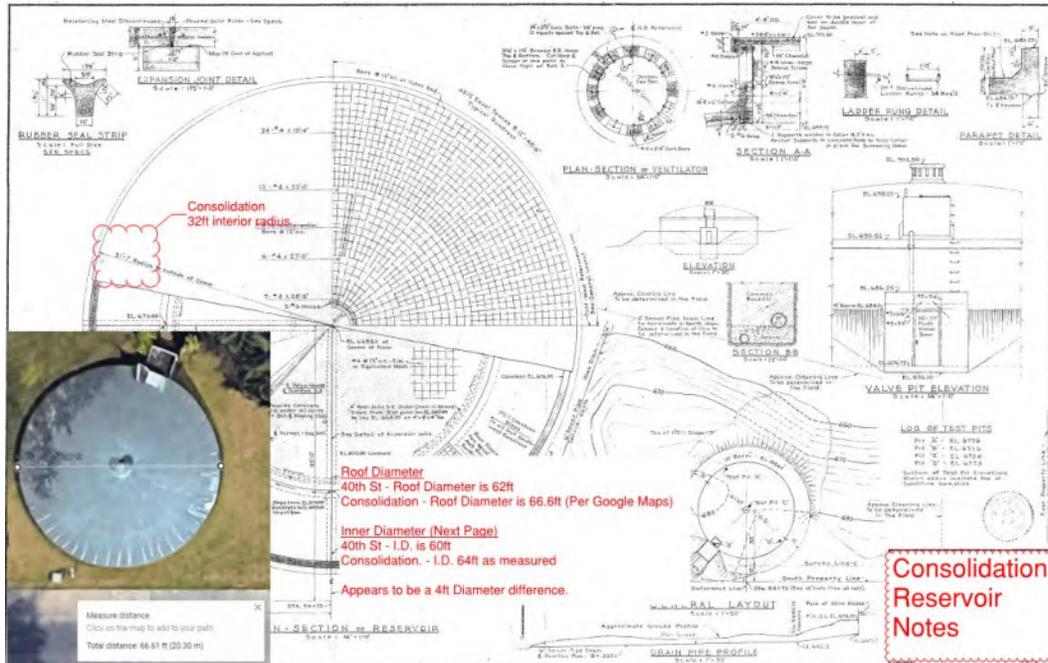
Consolidation Reservoir Plans and Elevations (Drawings are based on 40th St)
